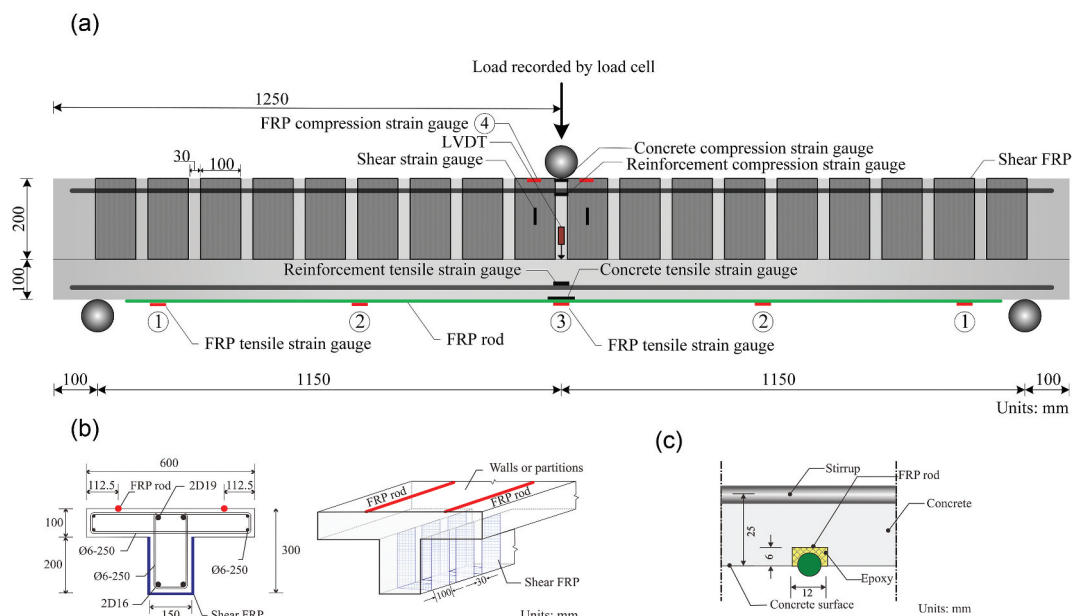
The details of the experimental setup and tested beams (Sapulete 2018). (a) Test setup; (b) Specimen details and FRP rods placement; (c) Half-embedded FRP rod detail.
